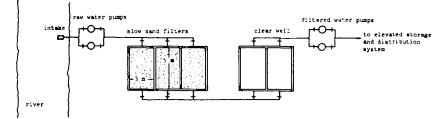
Plan of slow sand filtration plant, serving 1500-3000 people
